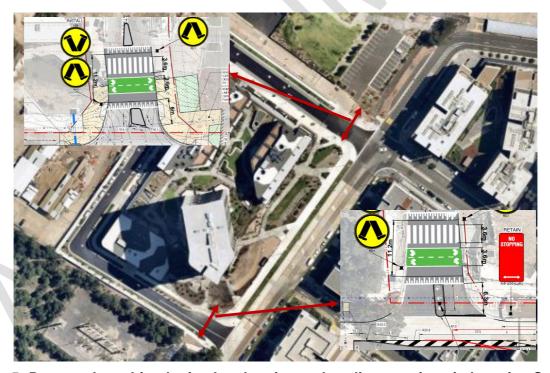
Proposed combined raised pedestrian and cyclist crossings in Lapwing Street at Hill Road, Sydney Olympic Park
